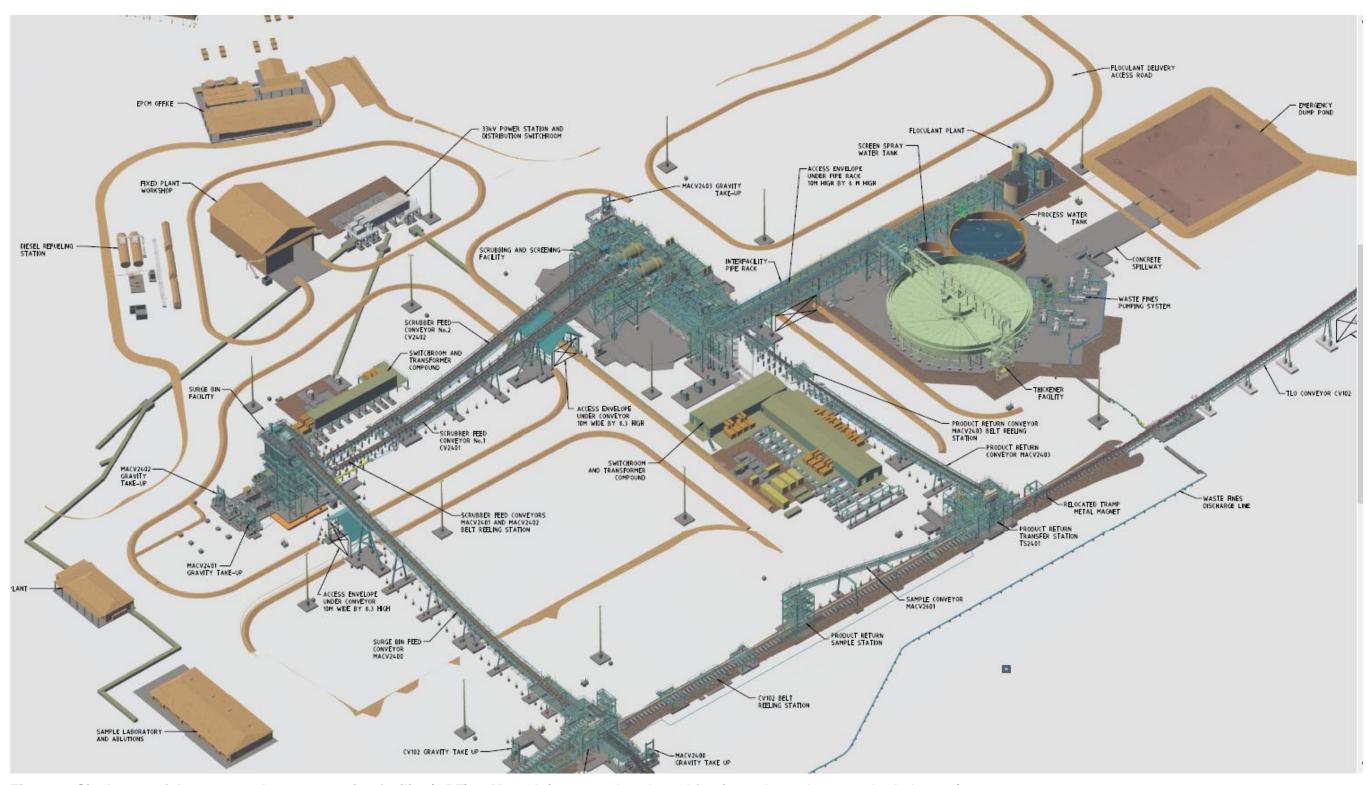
Site layout of the proposed ore processing facility (OPF) at Mesa A (concrete bunds and footings shown by grey shaded areas)
